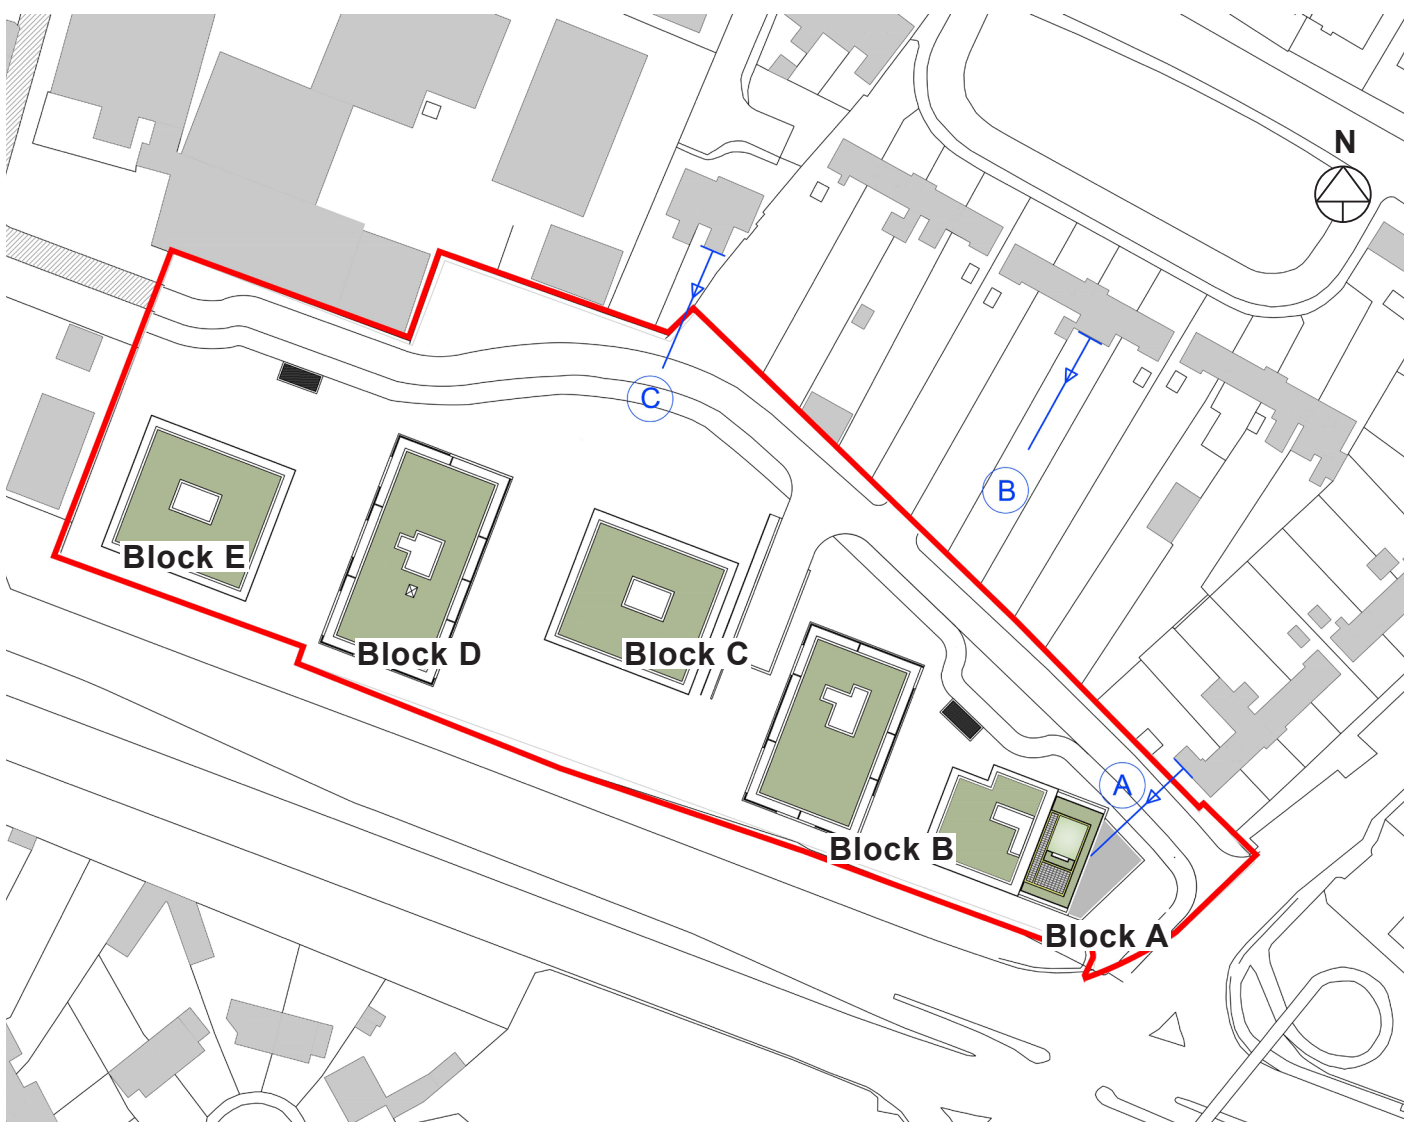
Proposed Site Plan noting properties with the closest windows facing onto the development.
